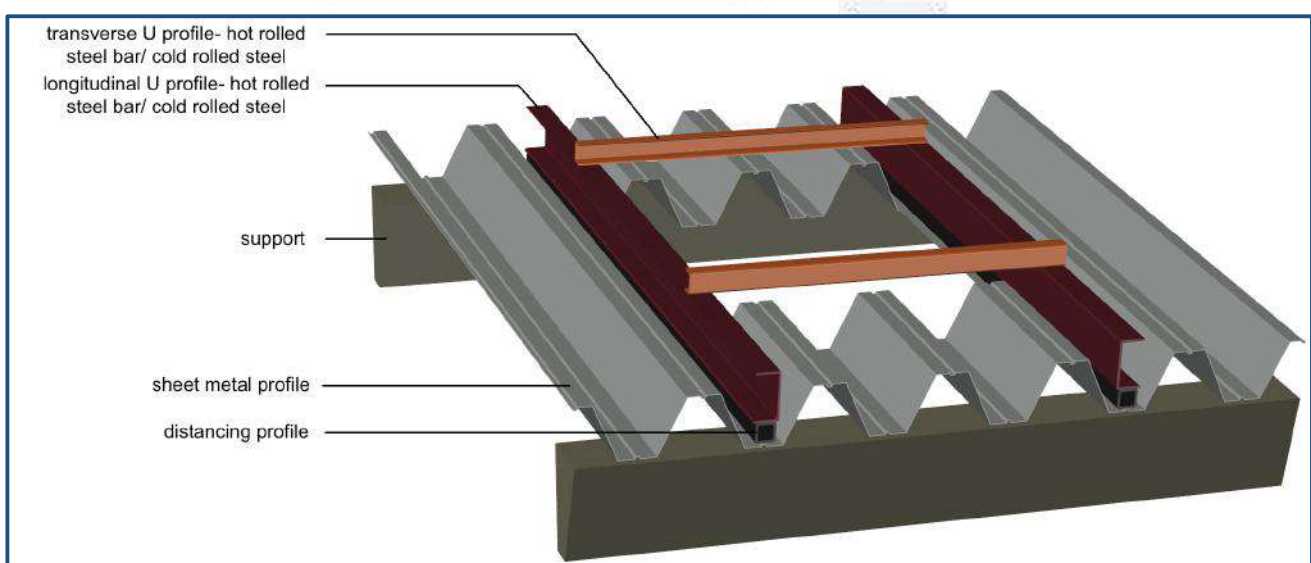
Scheme for reinforcement - above, installation after the trapezoidal sheet
